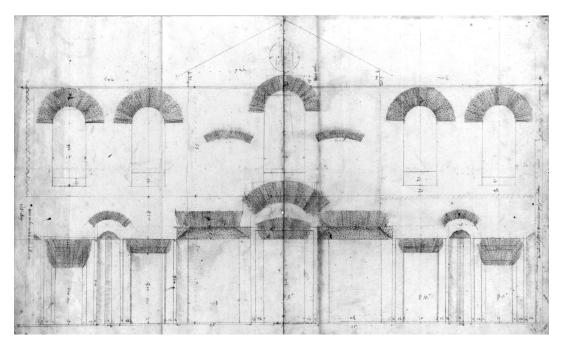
Francesco Borromini, S, Giovanni Laterano, Rome, 1646-9. Elevation drawing of façade showing structural arch and lintel reinforcements for brickwork over the openings.
